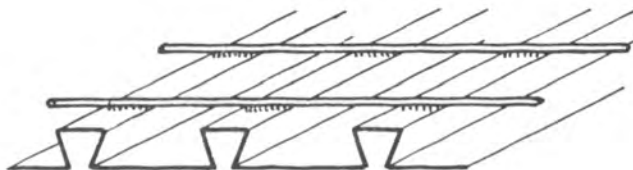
Reinforcement bars welded over the troughs as additional anchorage.
